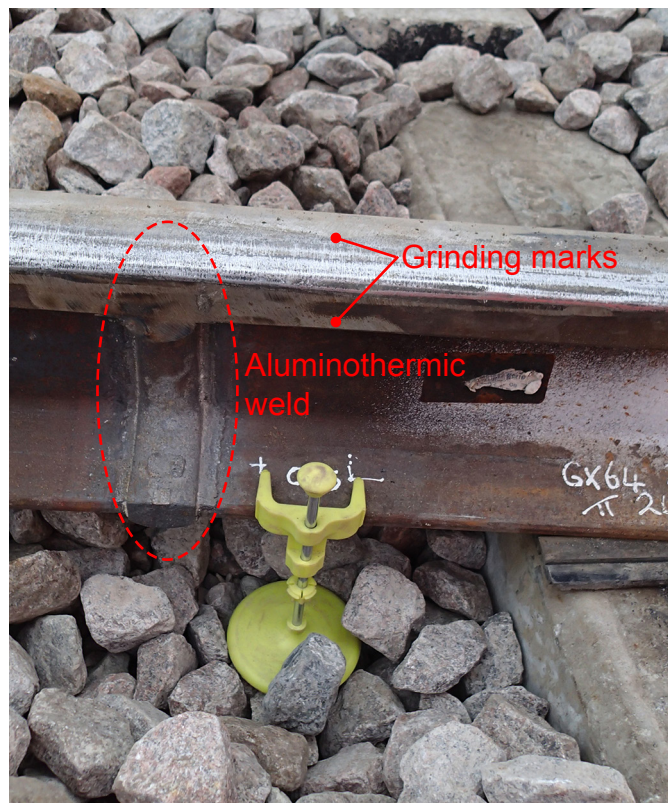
Aluminothermic weld on the left-hand rail of panel 13 (photograph shows a void meter used to measure track deflection)
